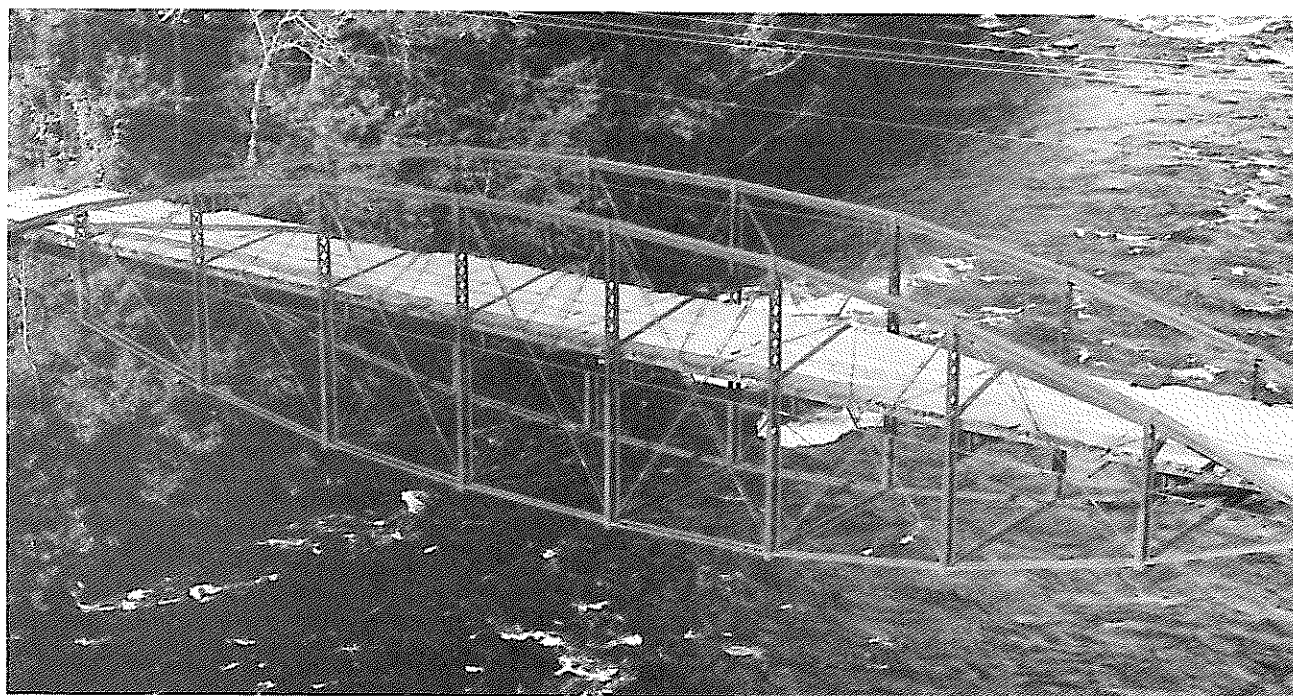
Old Corinth Road Bridge over the East Branch of the Sacandaga River, Hadley, New York (photo credit: Jet Lowe).
